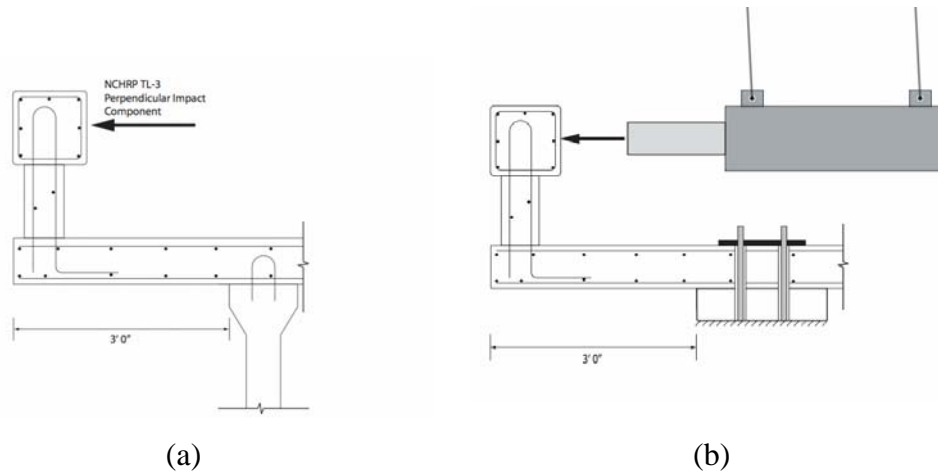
(a)- Schematic of T203 bridge barrier in a typical highway configuration, and (b) bridge deck and barrier specimen at FSEL
